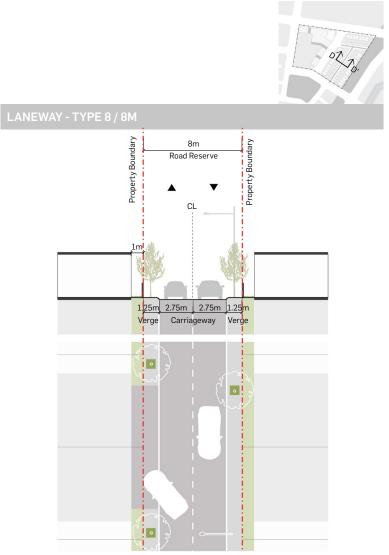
Indicative Street Section D-D' - Laneway - Type 8
